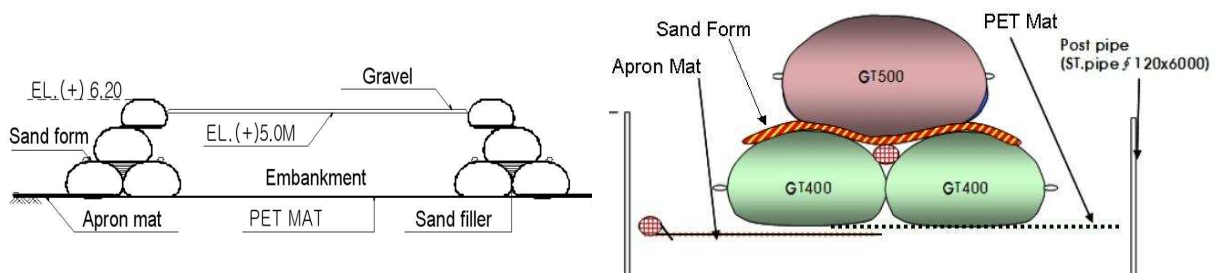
Geotextile-tube dikes to make temporary dry site for foundation works
